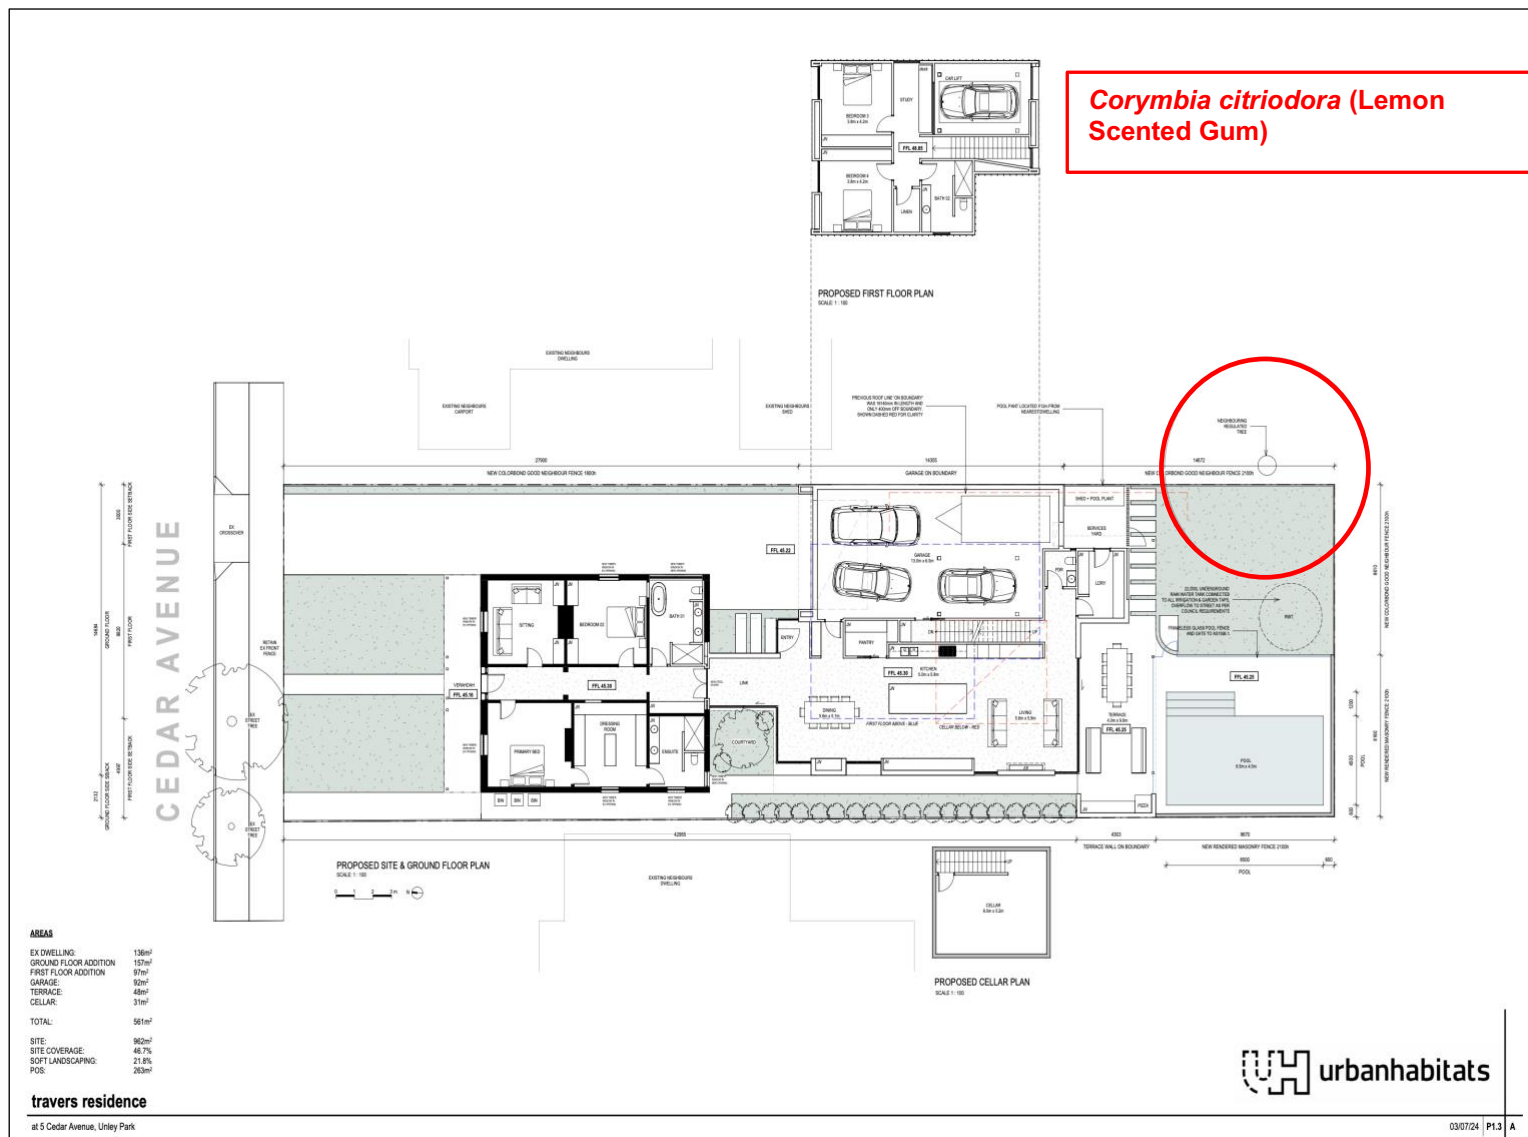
shows the proposed plans for the development at 5 Cedar Avenue, Unley Park which include new addition/garage top the exiting dwelling and a new swimming pool. The subject Lemon Scented Gum is highlighted in red.
